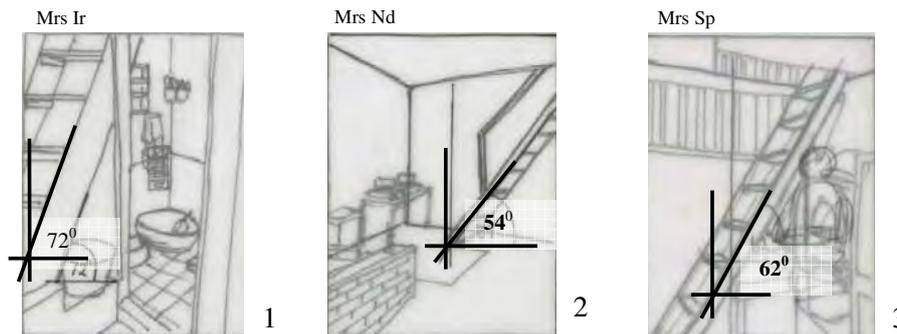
Some sloppy stairs inside informants' house: bathroom under the stair (left), bath room near the stair (middle), kitchen under the stair (right)
